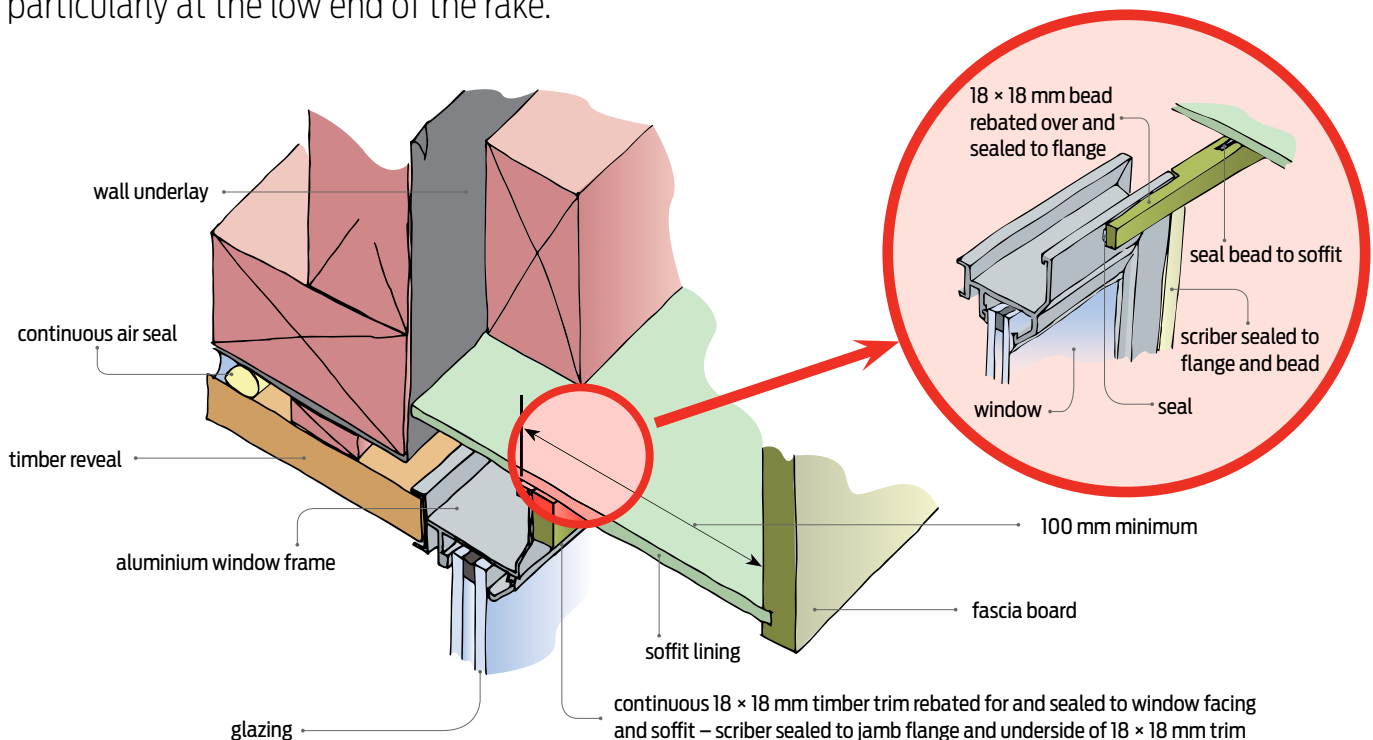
Raked window head directly under soffit (based on traditional soffit installation). A window head detail based on BRANZ's soffit details in *Build 158* will be published in *Build 163*.
